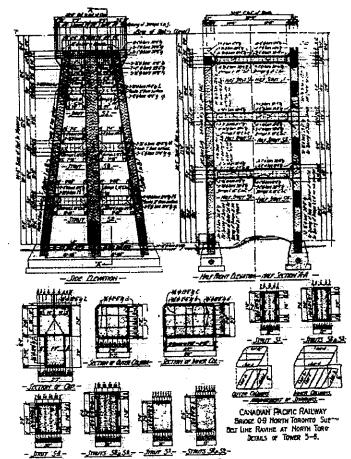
Bridge 0.9, Toronte Belt Line By. Ravine, North Toronto Subdivision, C.P.R. Details of towar 5-8
